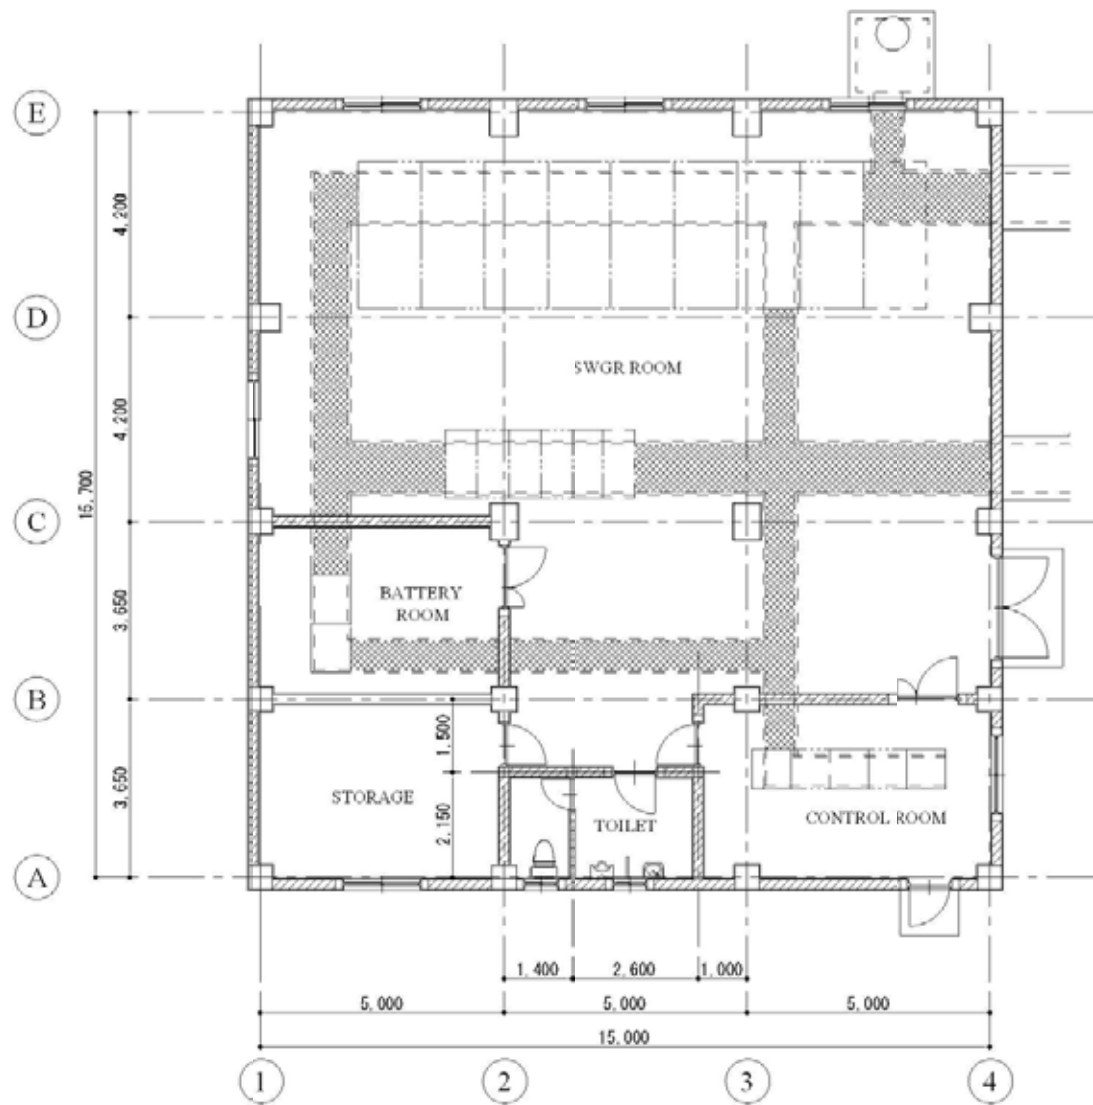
Floor Plan of Mwanyanya Substation Control Building
